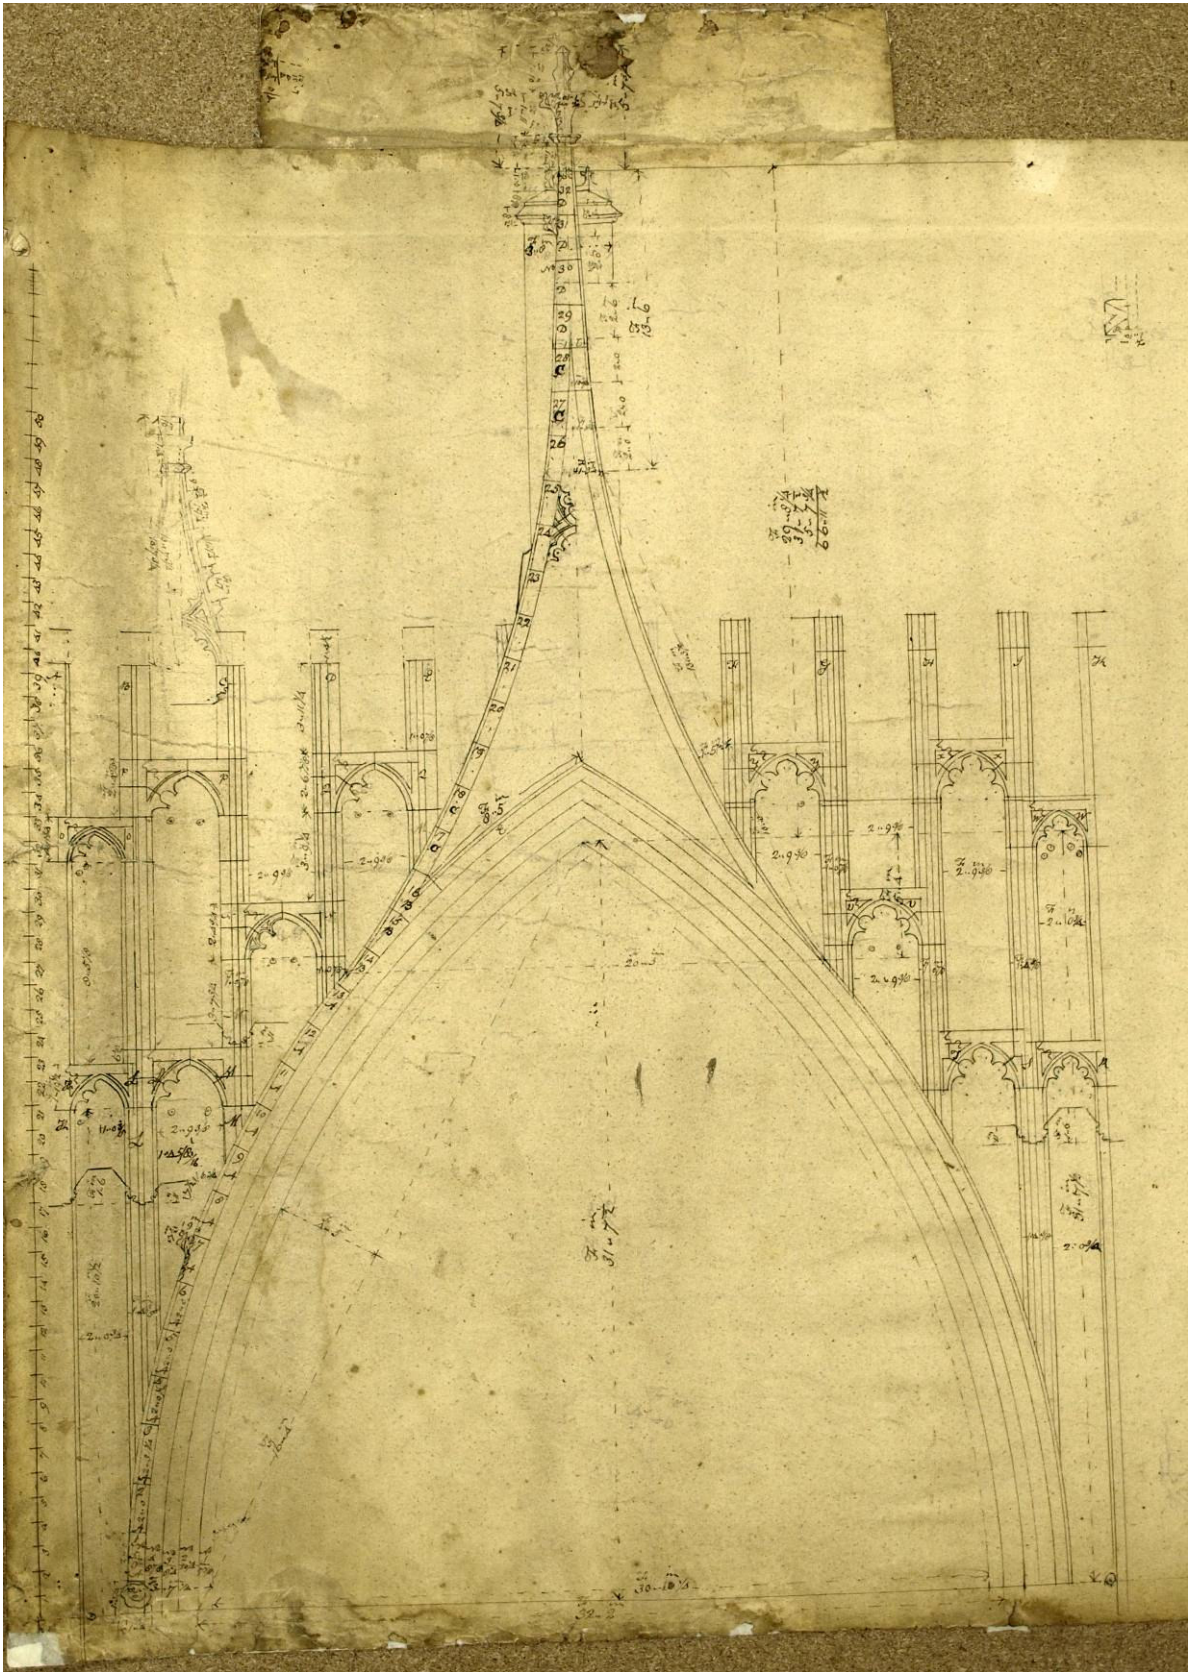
Elevation of the head of the Great East Window, William Shout c.1825 (YML/3/16)
